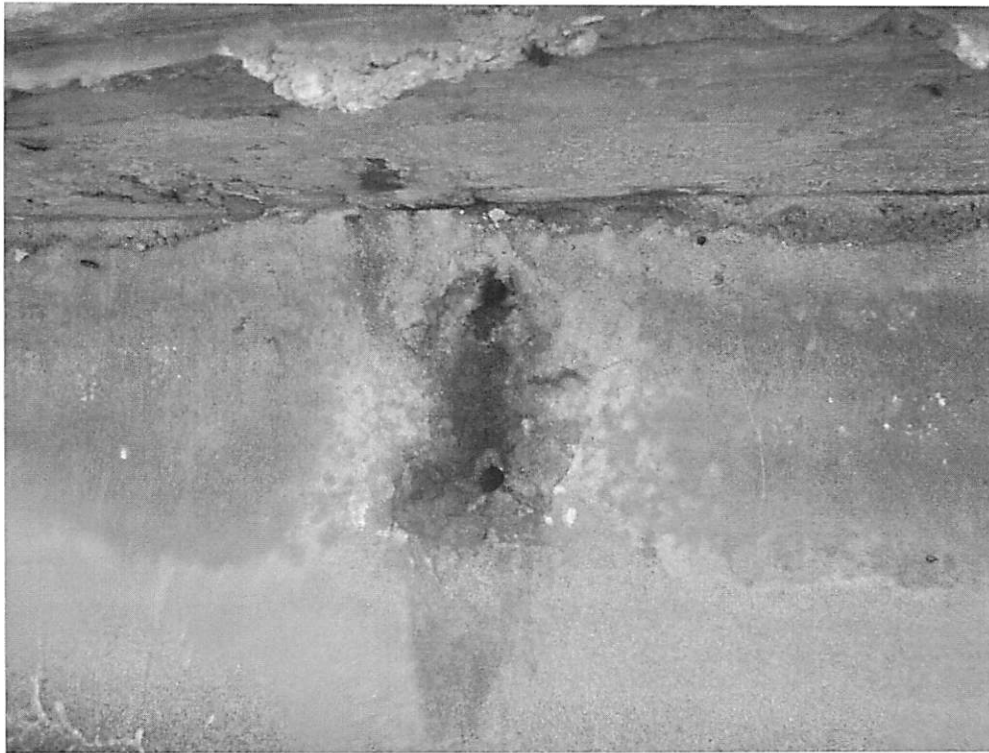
Cracking in King Pile, Spalling Cap
